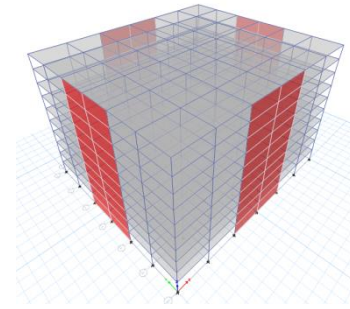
3D Plane of Model-04[SWP-03]
